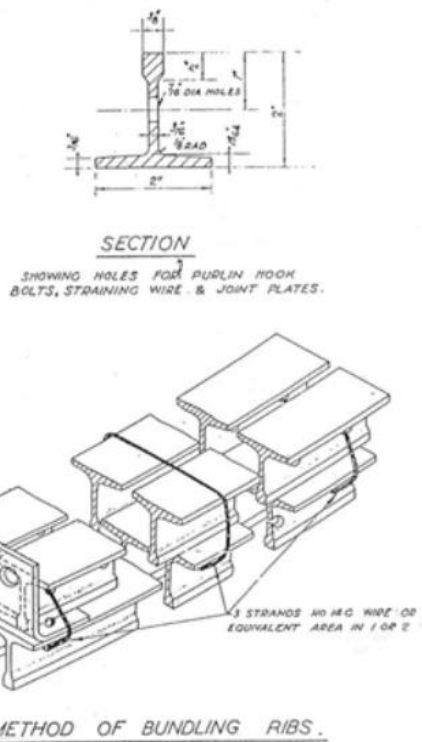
Proprietary T shaped rib used to form the steel arches. The ribs could be broken down into shorter lengths and bundled together for transport
